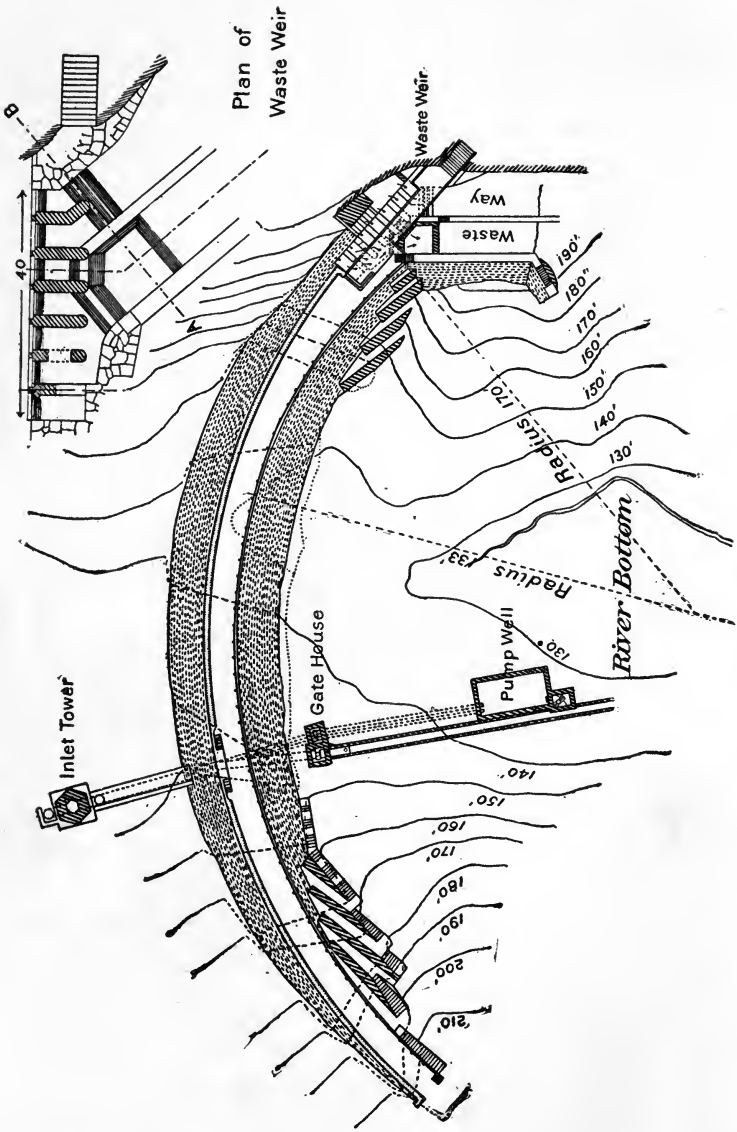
PLATE XXIV.—PLAN OF SWEETWATER DAM.
